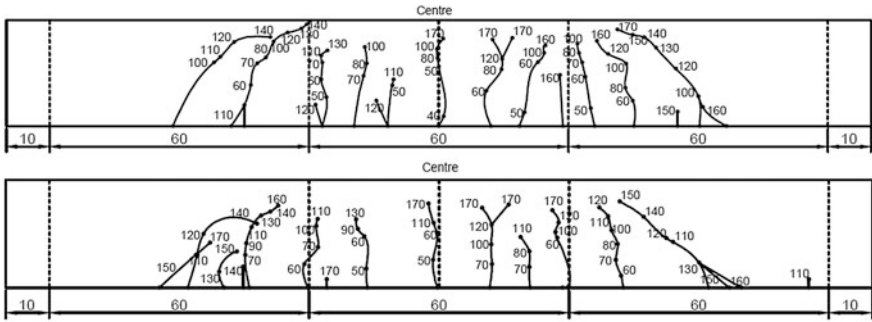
Crack pattern of mS-HPC beam (side 1 and 2)
